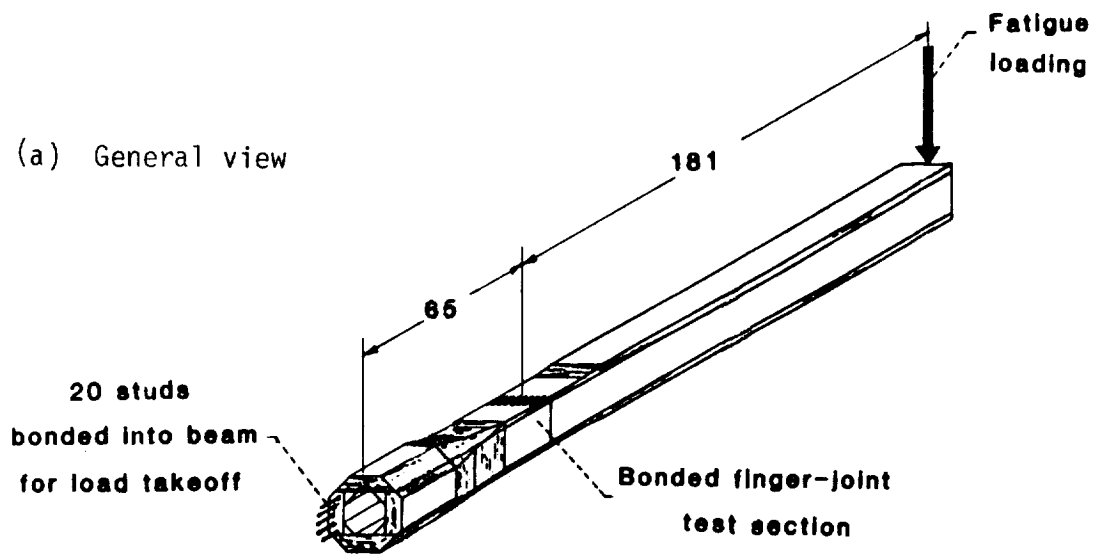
Cantilever beam fatigue test specimen containing bonded finger joint (all dimensions in inches).
